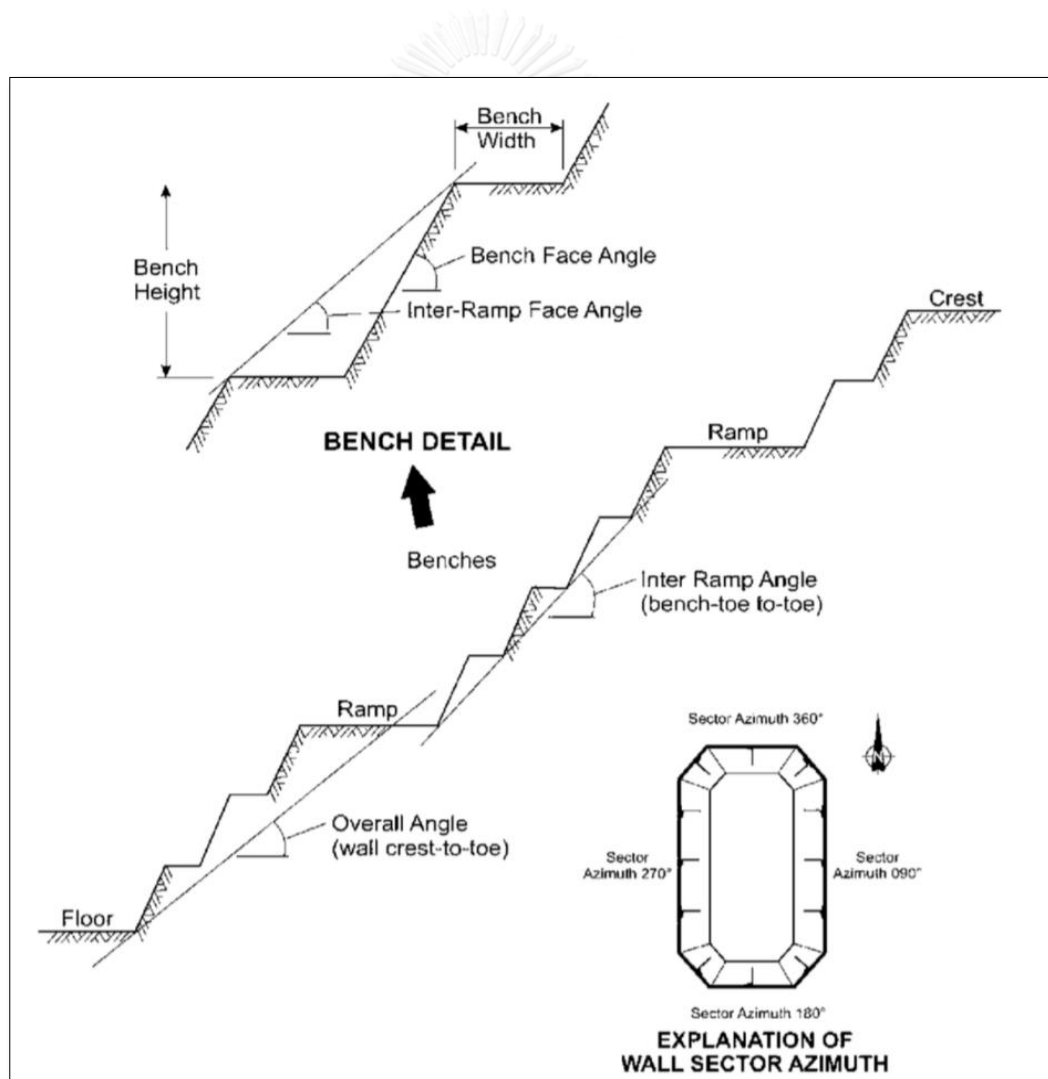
6 Pit wall terminology (Read & Stacey, 2009)
